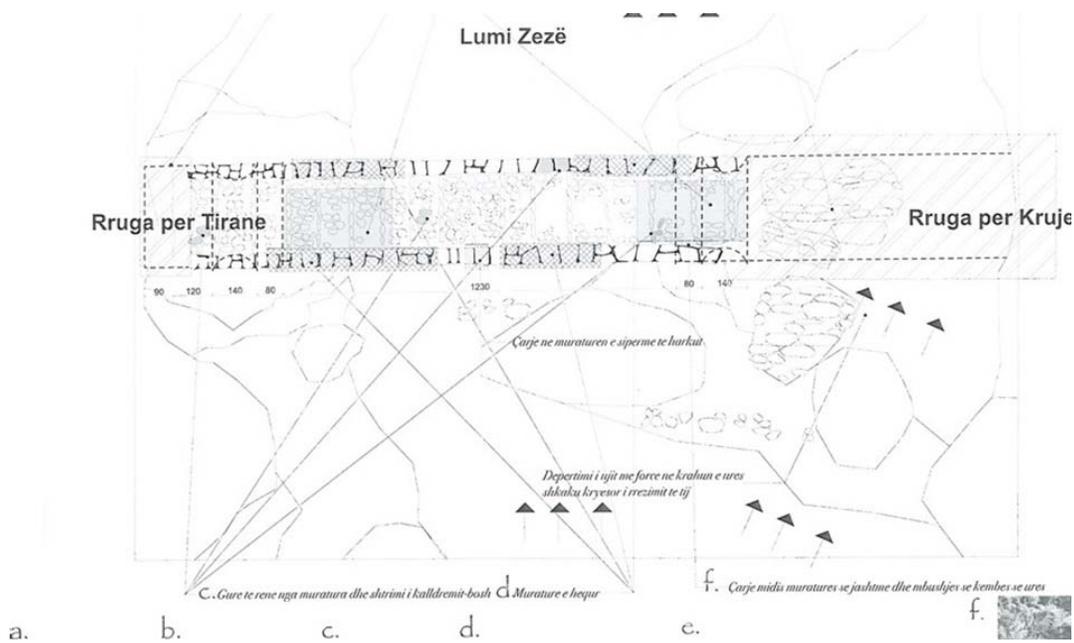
Planimetry of previous interventions projects (extracted from the IMK Archive)
